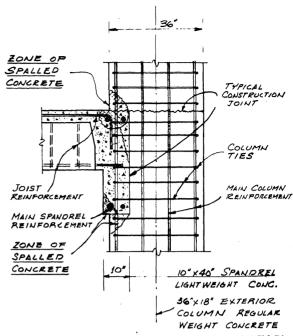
TYPICAL CONSTRUCTION DETAIL OF EXTERIOR COLUMN-SPANDREL-JOIST CONNECTION, FROM 4TH FLOOR TO ROOF BANK OF CALIFORNIA (1)
